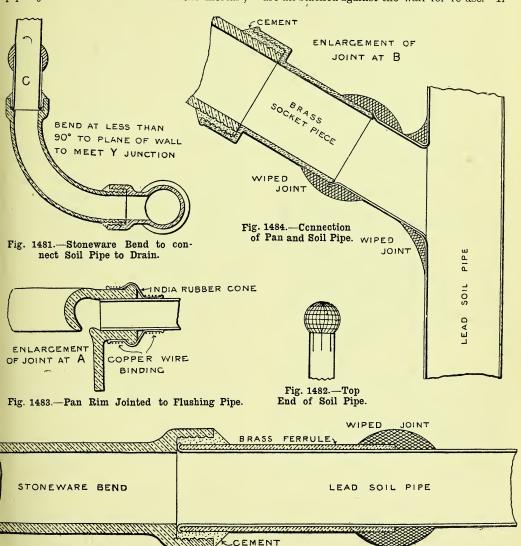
Stoneware Bend Jointed to Foot of Lead Soil Pipe.
